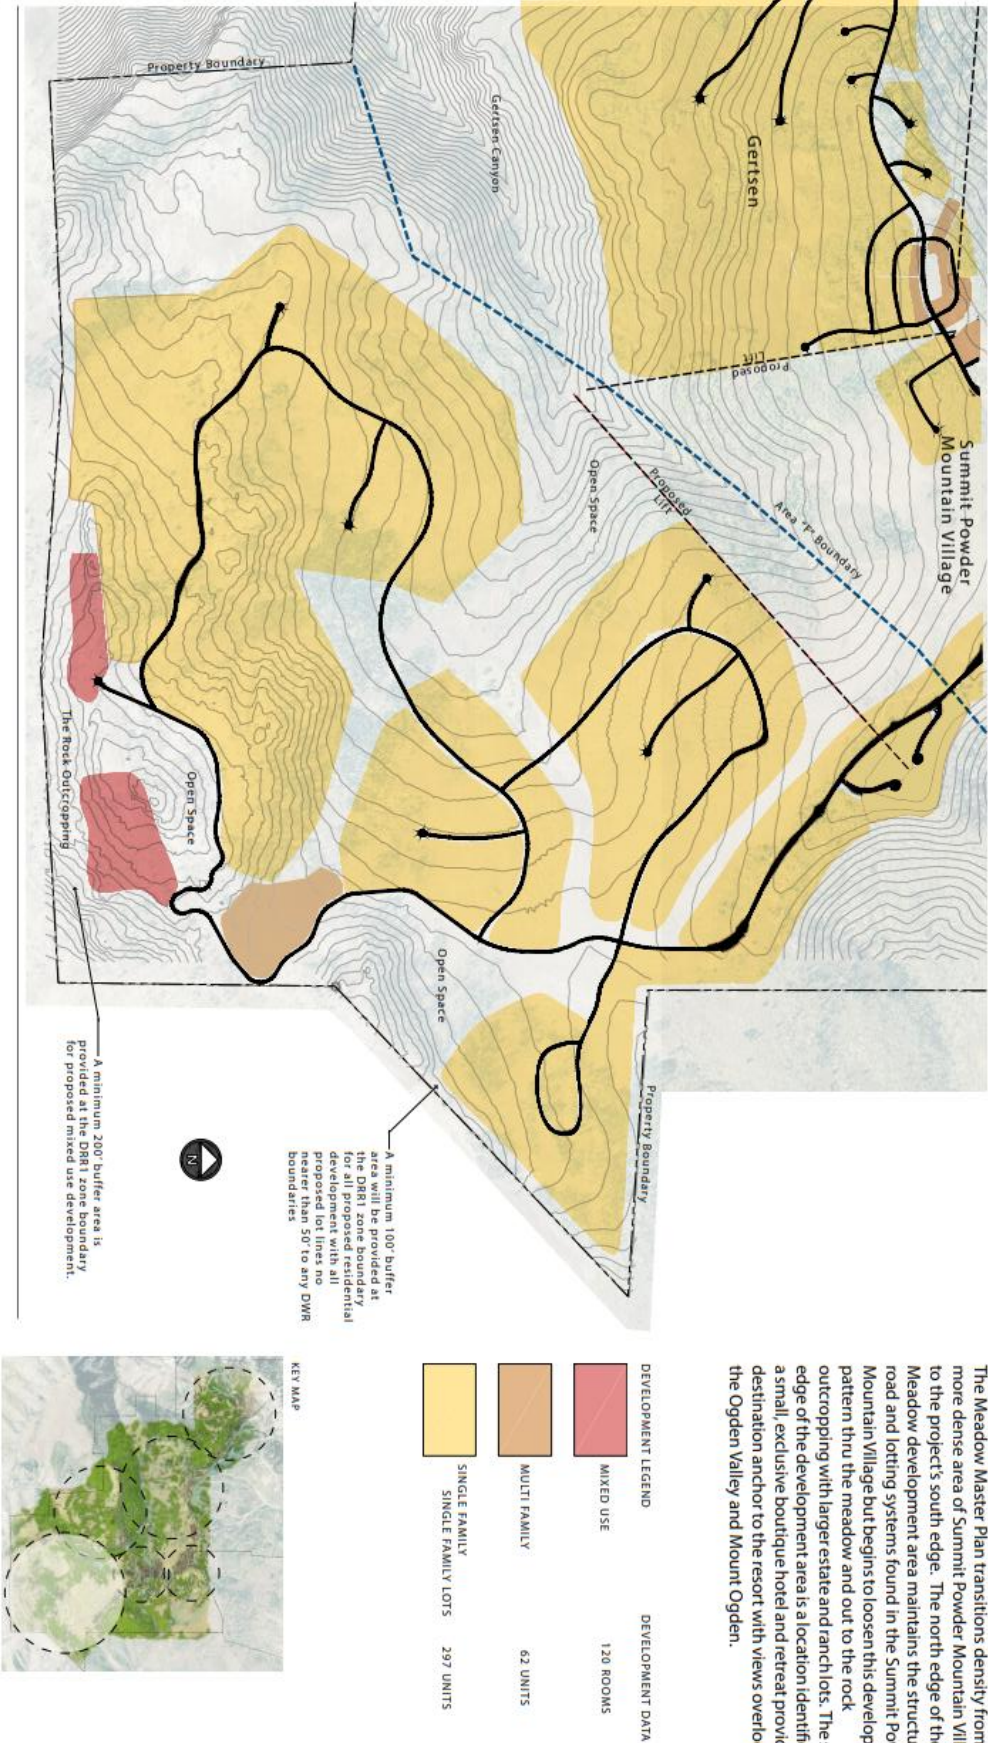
EXHIBIT B – Approved Concept Development Plan for Area F
